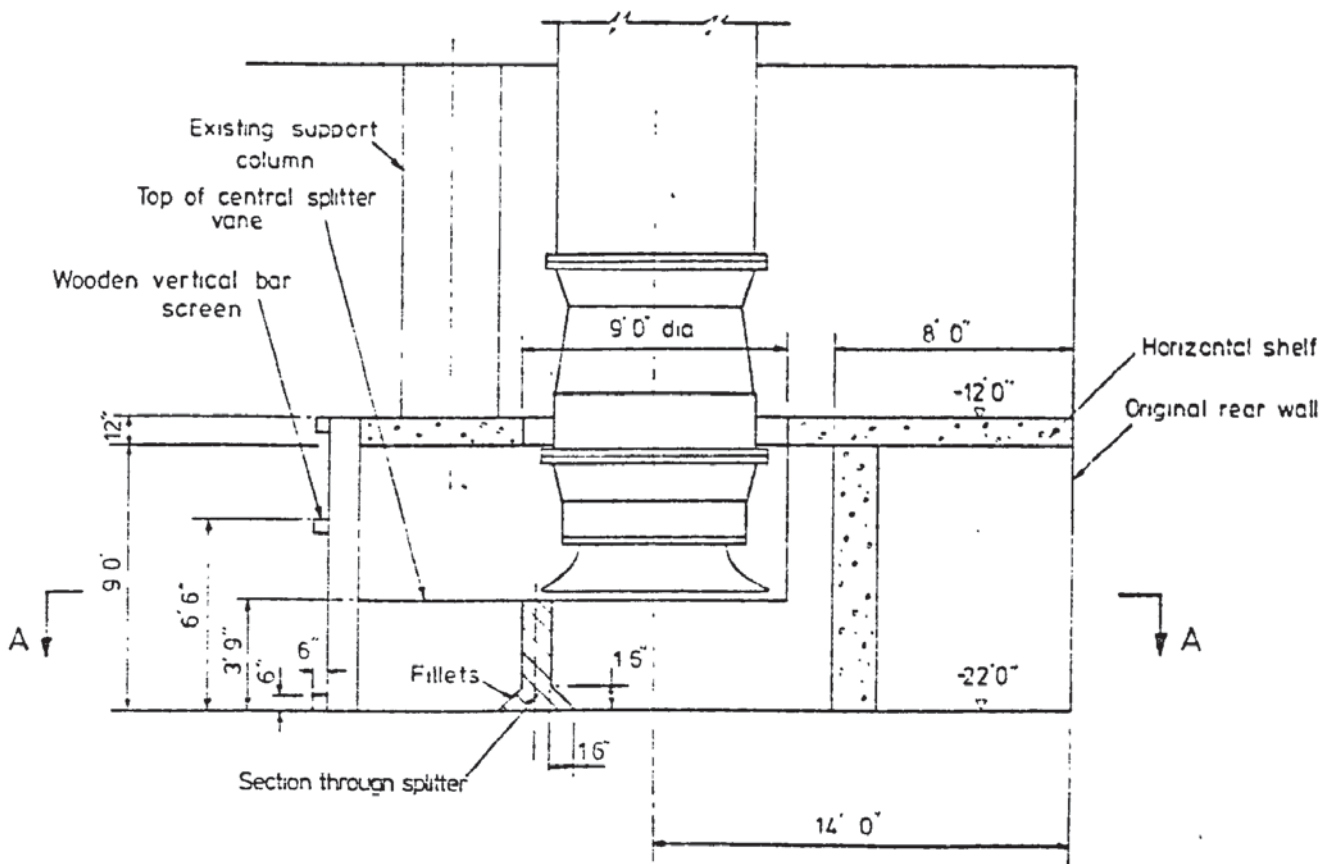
Typical section through one pump bay of final design of No. 1 unit.
